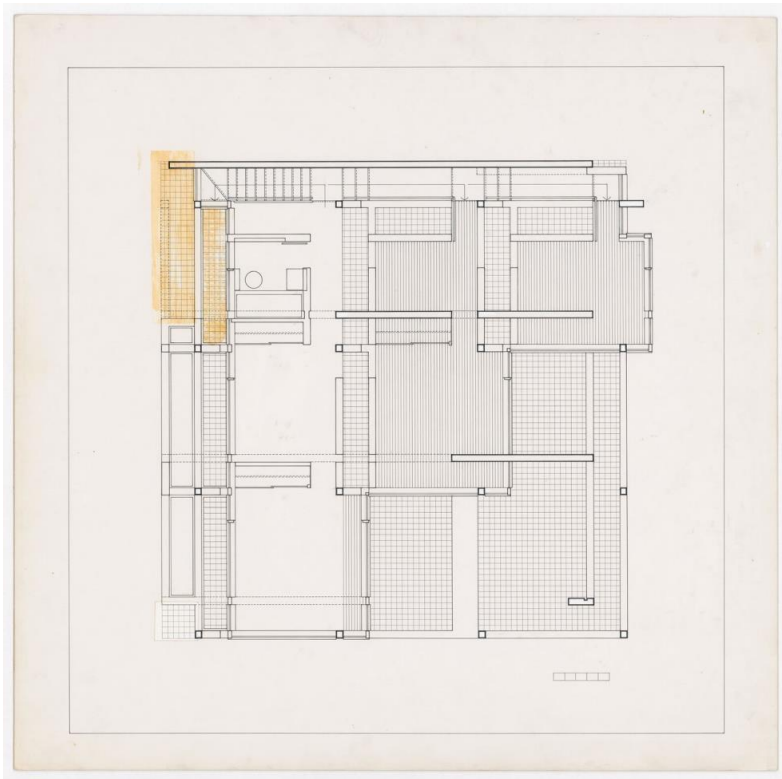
Upper Floor plan of House II where one can see the “structural bi-valency” of the wall and column systems. 1970, Peter Eisenman Fonds, Canadian Centre for Architecture, Montreal.
